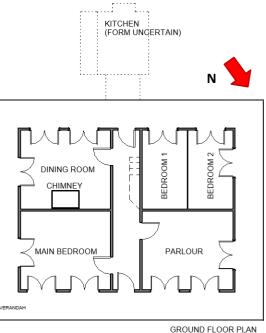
Ground floorplan of the original cottage's form and layout (AHS, 2019; adapted from BHS, n.d.).
